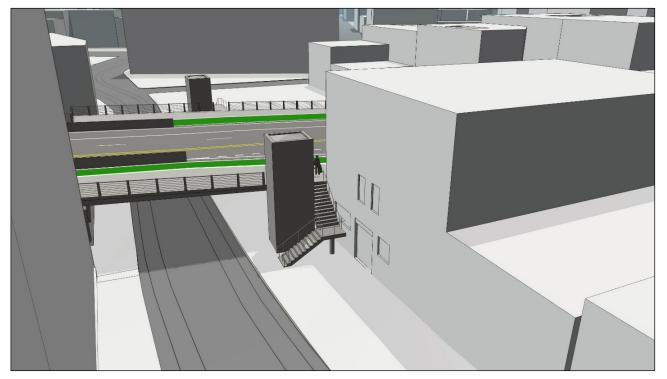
Proposed new pedestrian access at north side of west approach, artist's rendering, aerial view looking southwest (Fat Pencil Studio, 2021).
